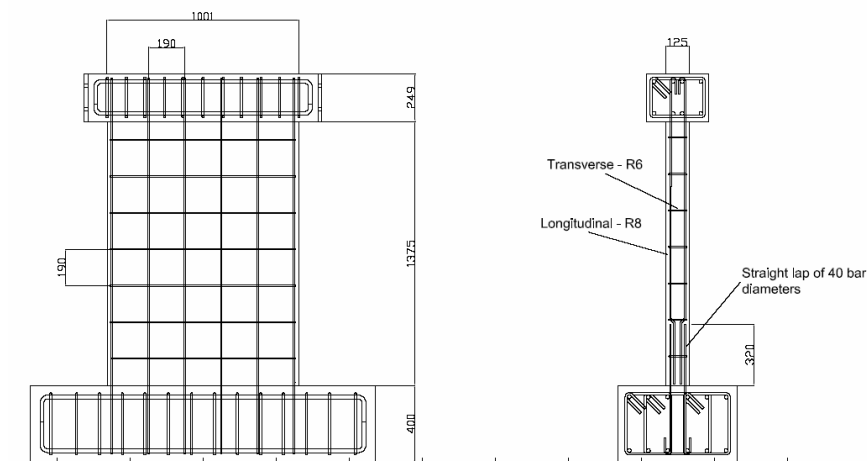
Experimental specimen with plain round reinforcing bars and a straight lap detail.
